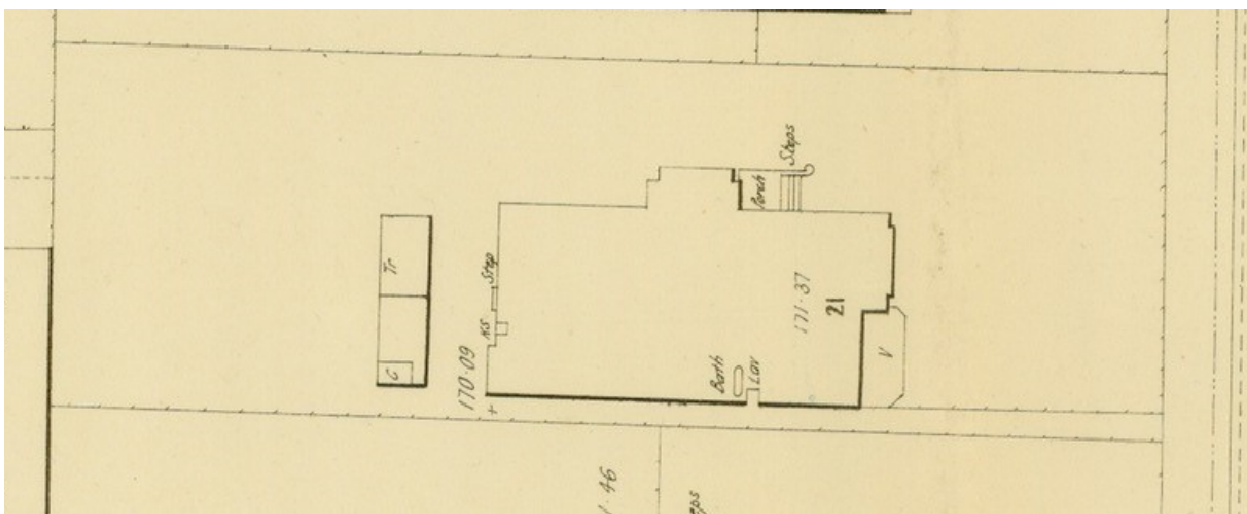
The 1901 Melbourne and Metropolitan Board of Works (MMBW) Detail Plan showed the footprint of the new house, with the verandah to the left and projecting bay to the right side, with the entrance porch and stairs off the north elevation. A long outbuilding was located to the rear of the house (since removed) (MMBW).
